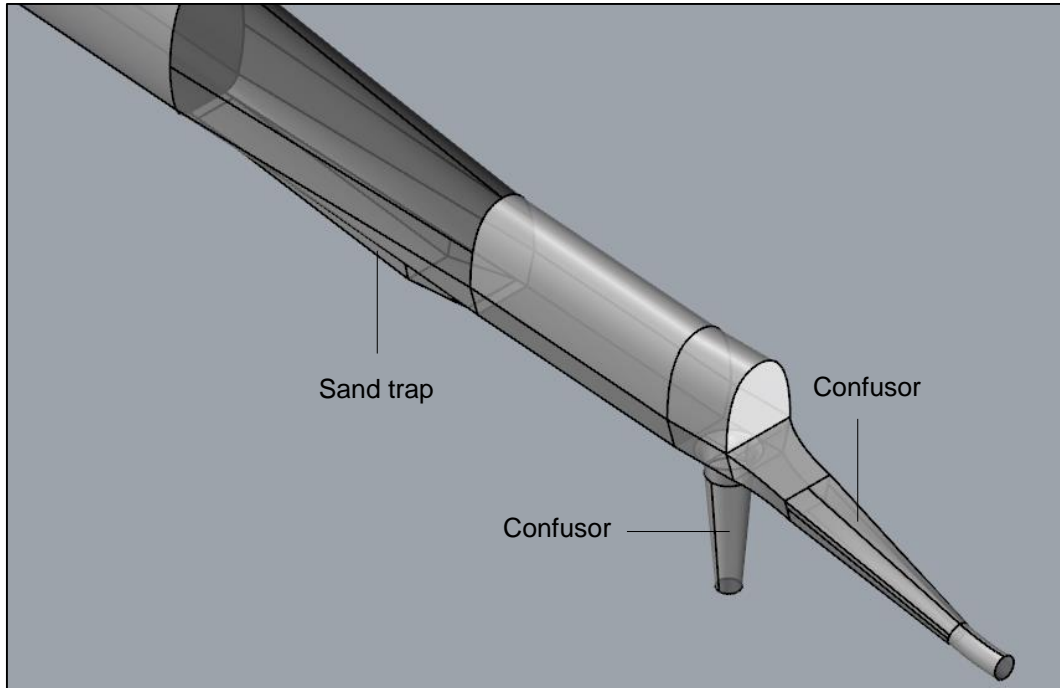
Layout of the intermediate intake for a conventional Underground Pumped Hydro Storage
